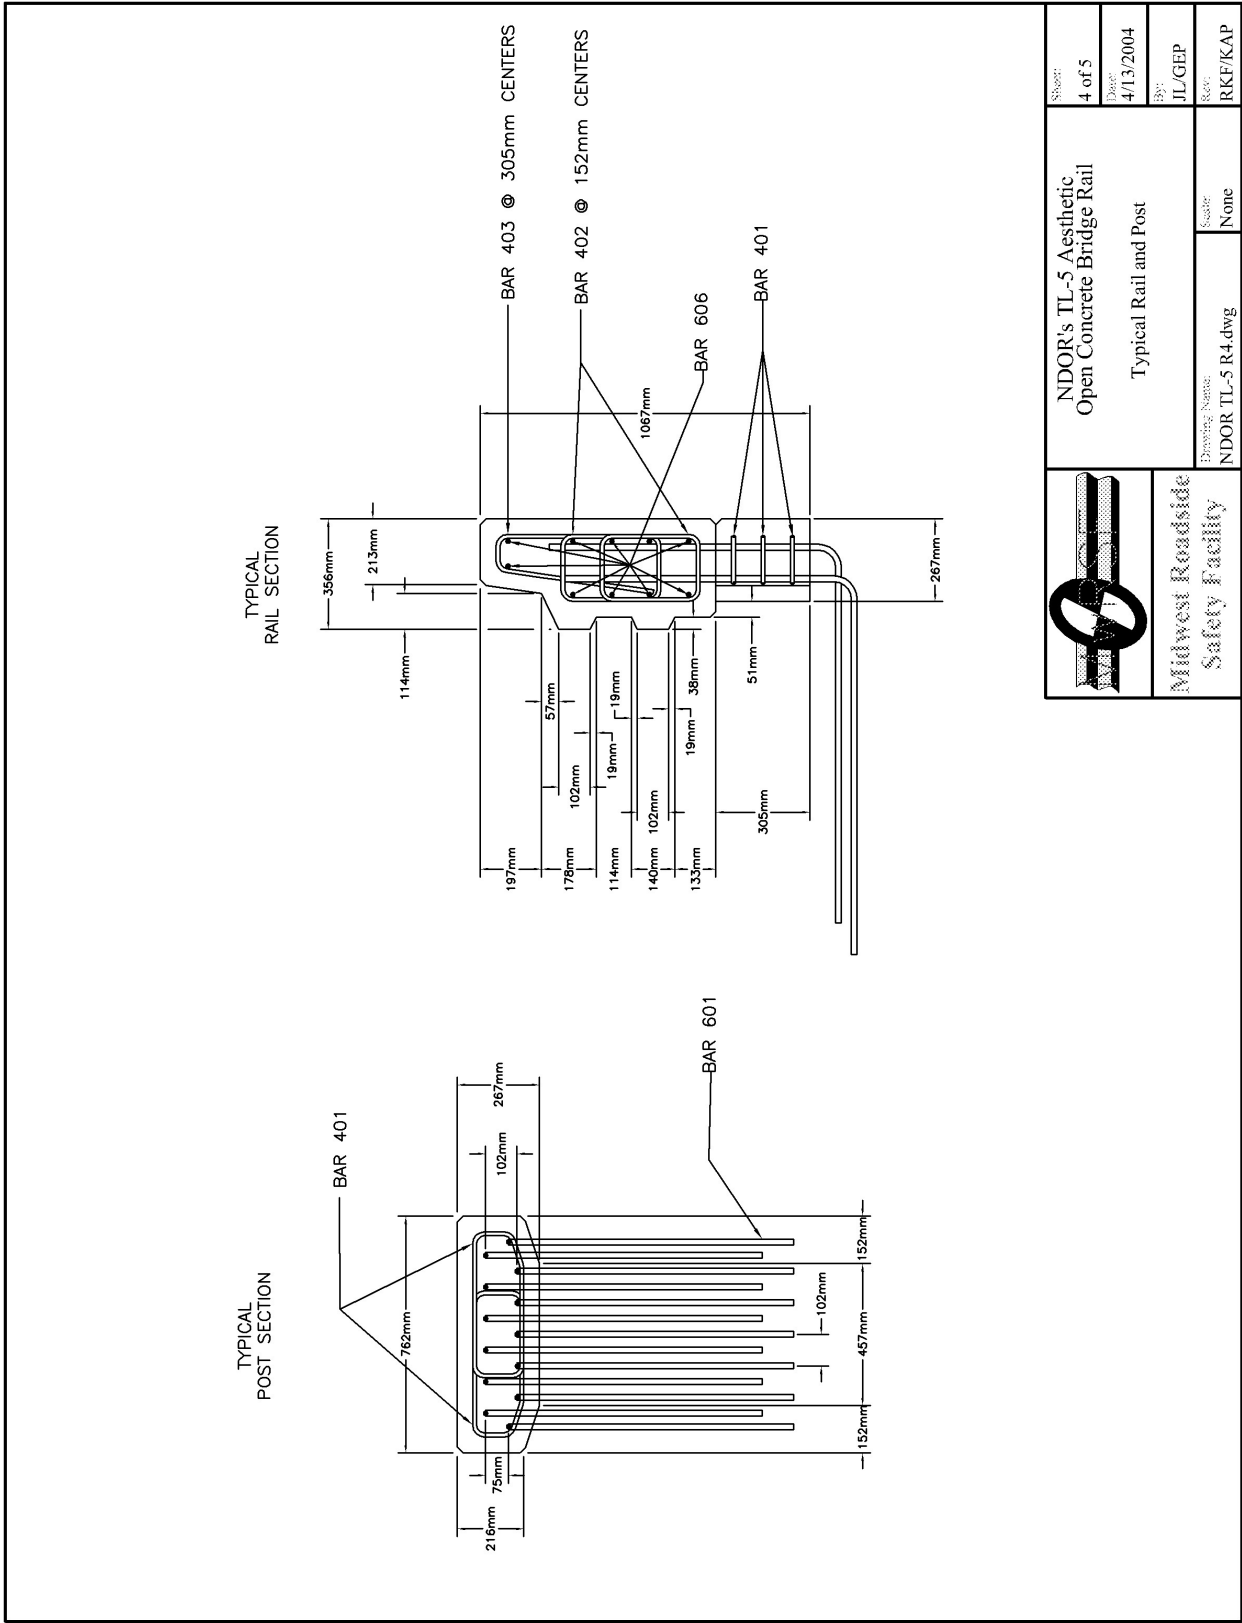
NDOR's TL-5 Aesthetic Open Concrete Bridge Rail Design Typical Rail and Post Details
